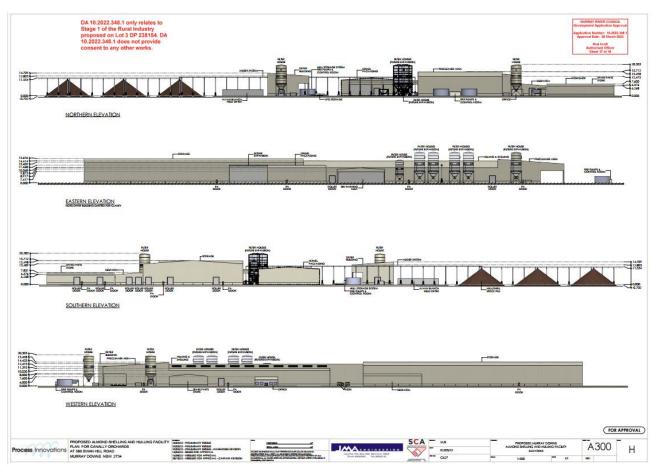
Approved Development Elevation Plan (JMA Engineering, 2024)
